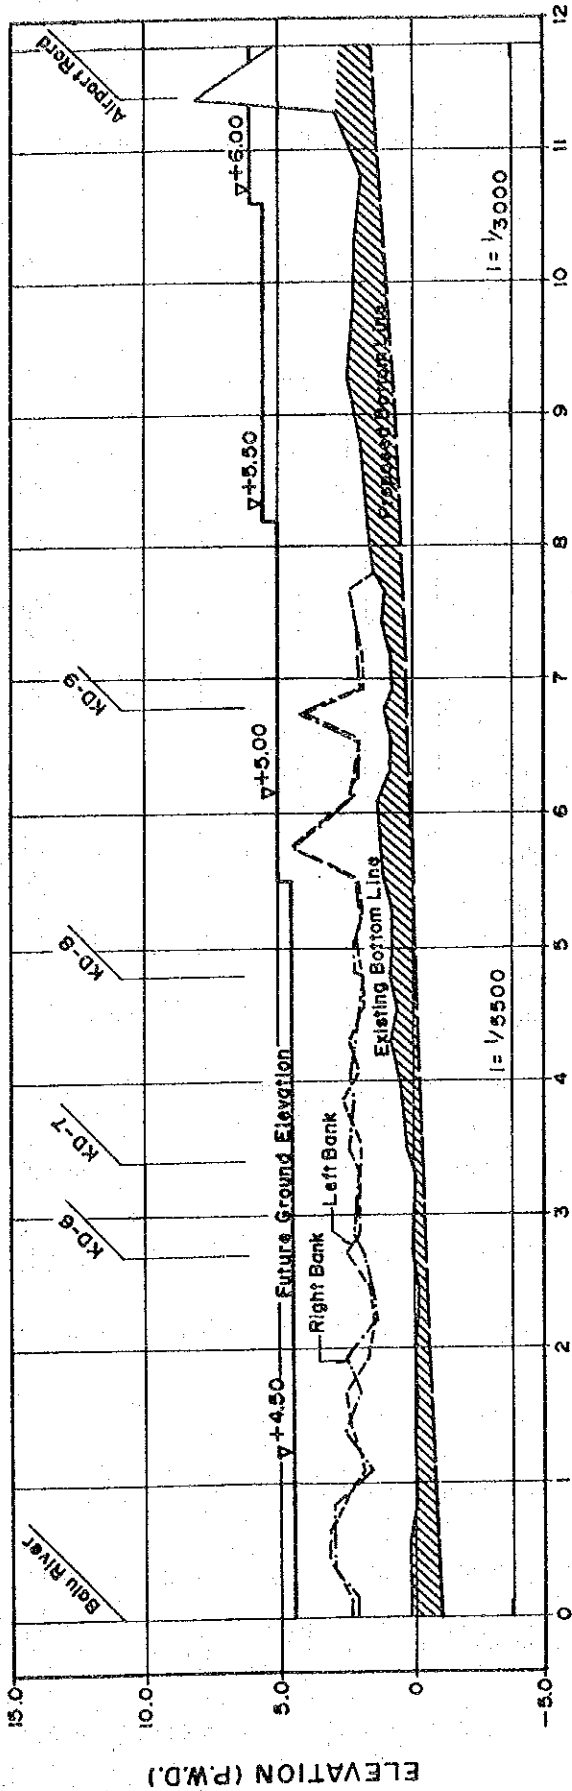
(1) PROPOSED LONGITUDINAL AND CROSS SECTIONS (KD-1)
